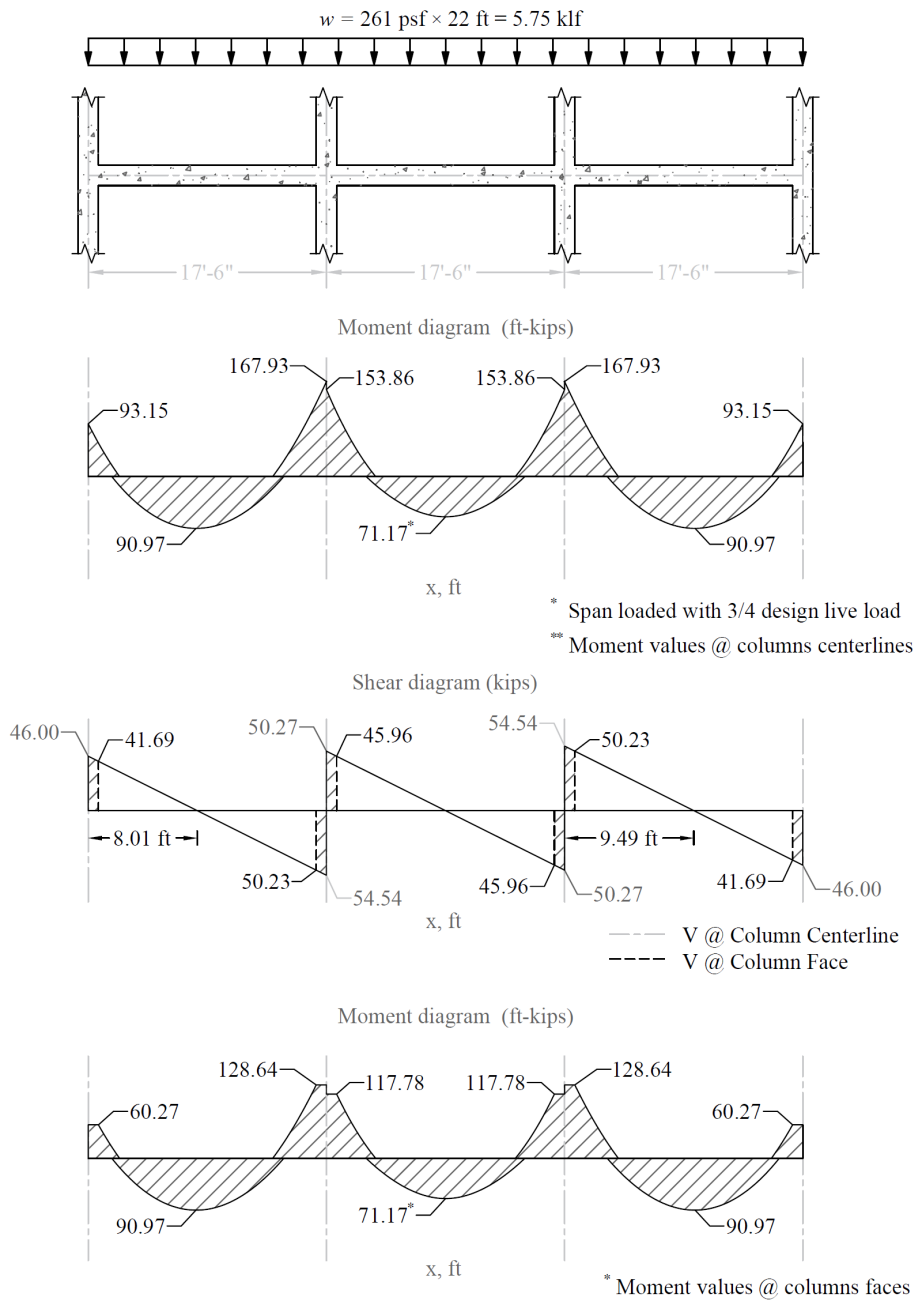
Positive and Negative Design Moments for Slab-Beam (All Spans Loaded with Full Factored Live Load Except as Noted)
